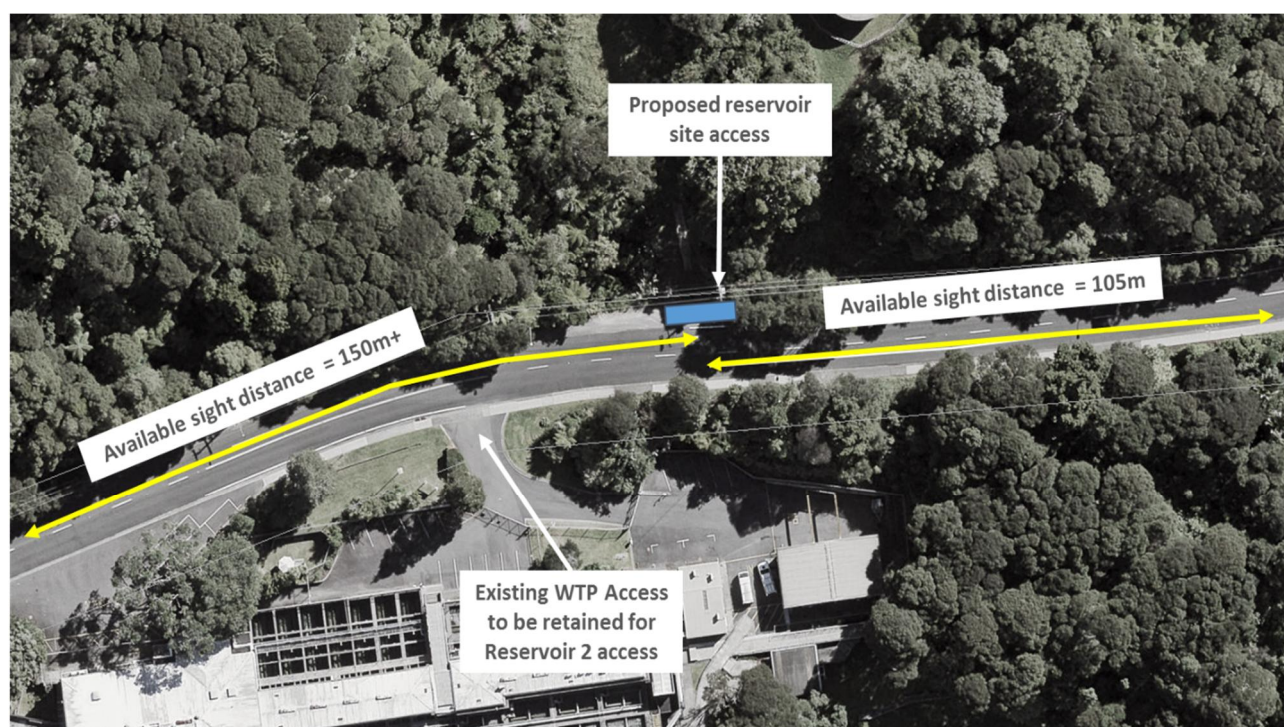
Site Access for Proposed Reservoir 1 and Reservoir 2 Site
